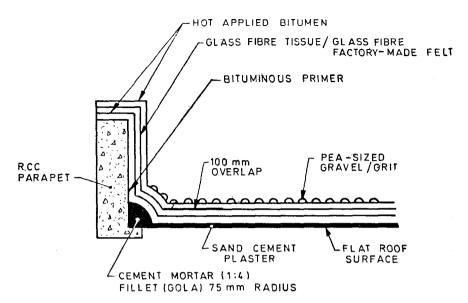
Waterproofing on a Flat Roof with RCC Parapet 450 mm or Less in Height-Typical Details
